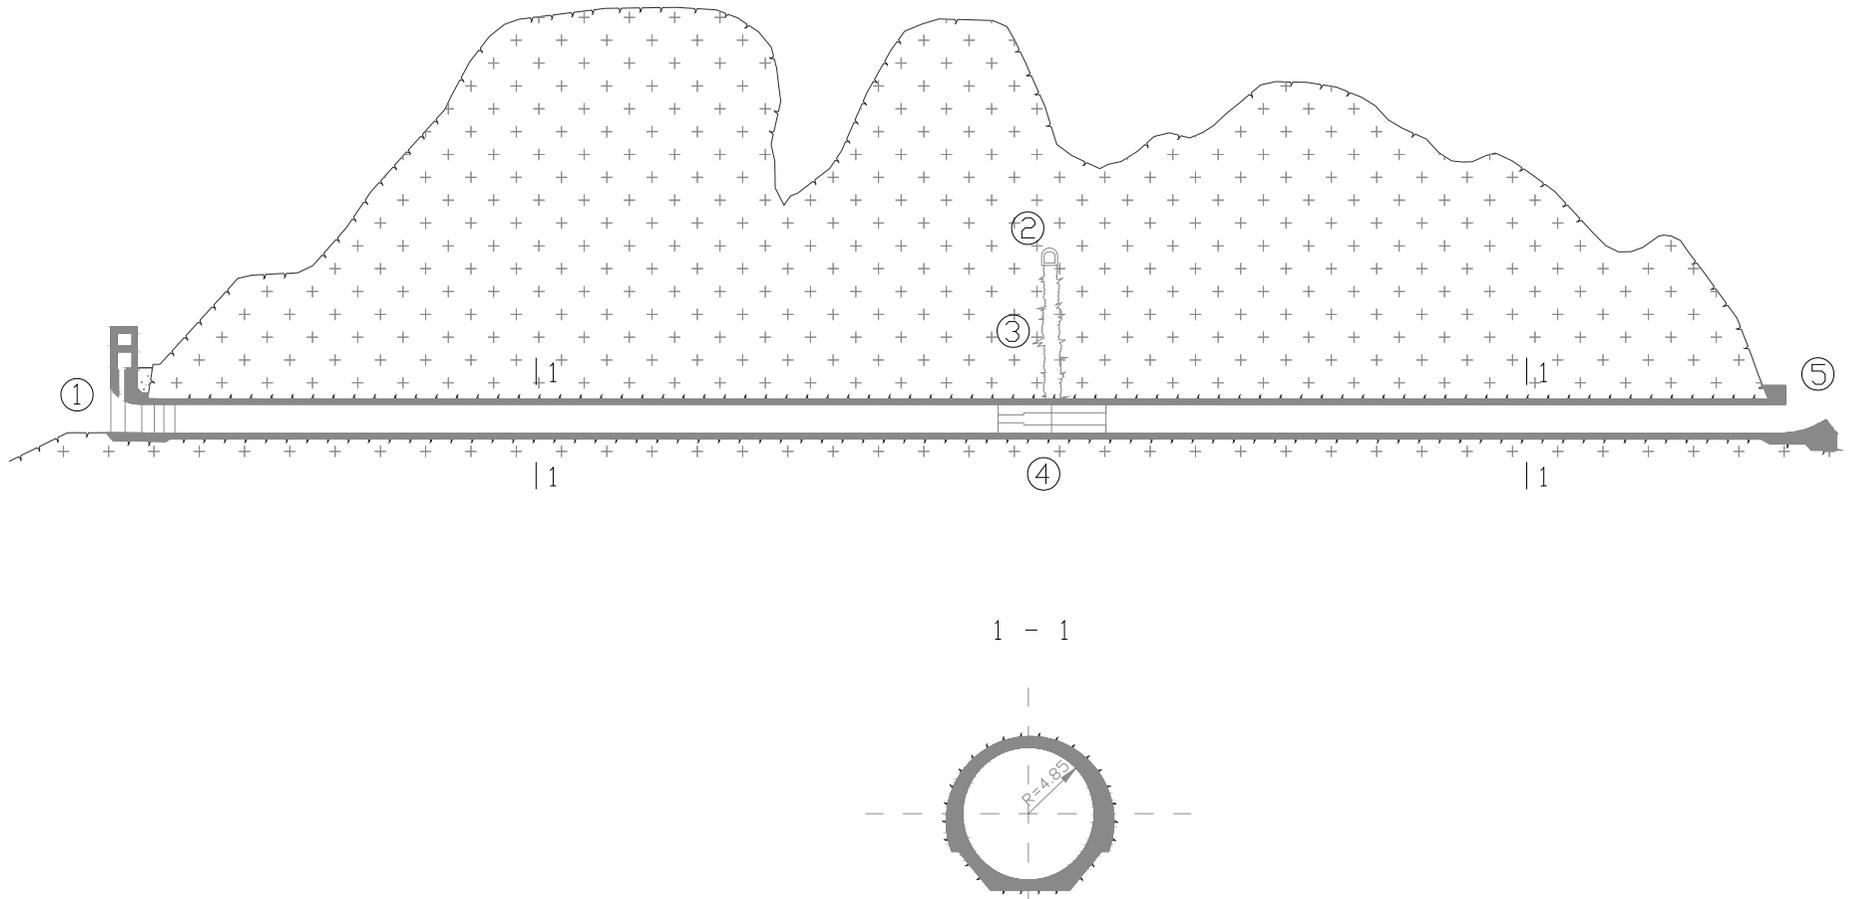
Longitudinal profile of diversion tunnel No. 1. ①: intake, ②: access gallery, ③: grout curtain, ④: concrete plug, ⑤: flip bucket.
